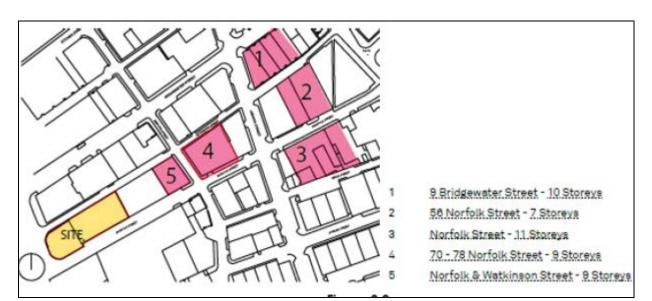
Recent approved plans for buildings of between seven and ten storeys adjoining the application site (indicated). From applicant's planning statement by Zerum
